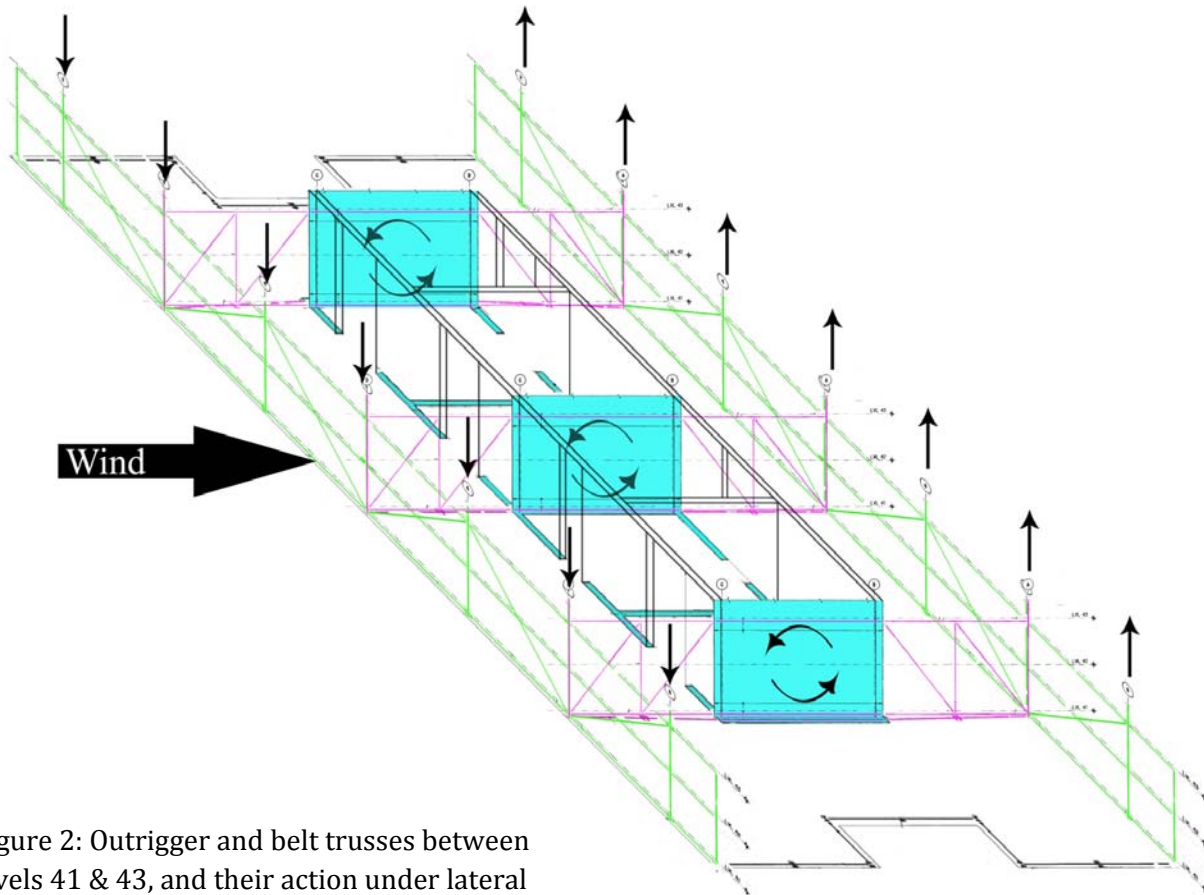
Outrigger and belt trusses between levels 41 & 43, and their action under lateral loads.
